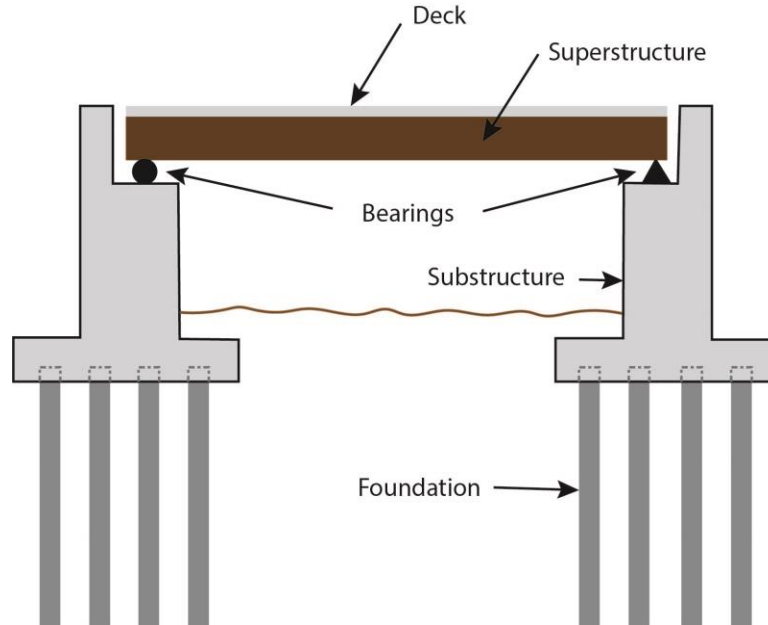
Schematic of a Single-Span Bridge Supported by Piles
